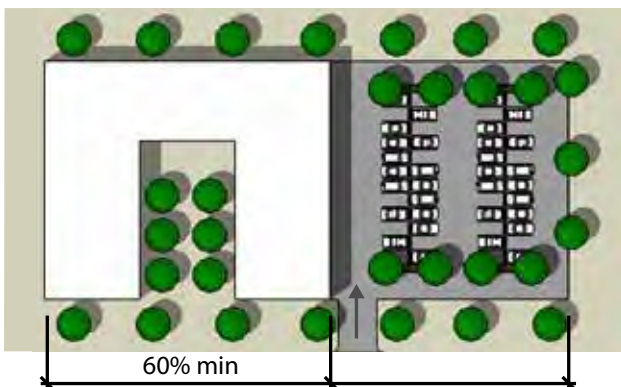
d.1.b.ii. Minimum street frontage for buildings with a central courtyard.
